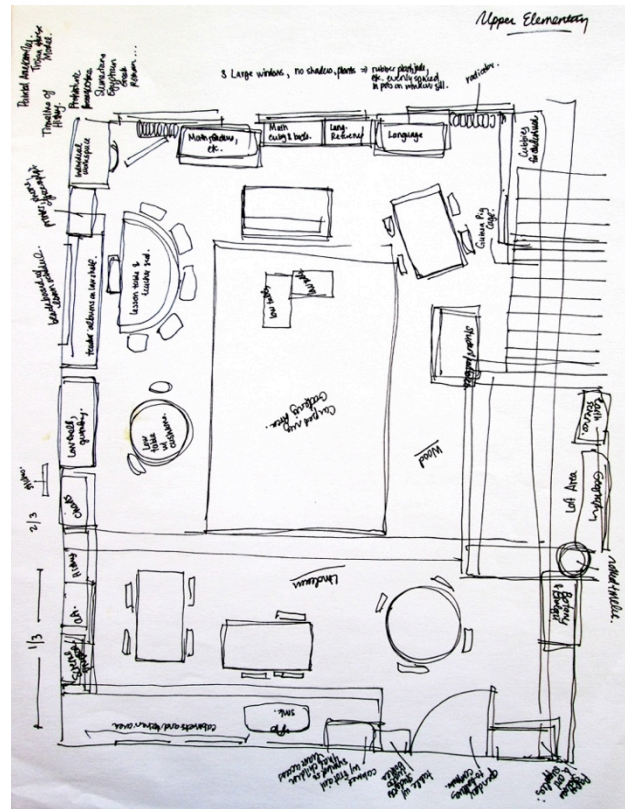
Sketch of floor plan of the E2 classroom at North Star Montessori
